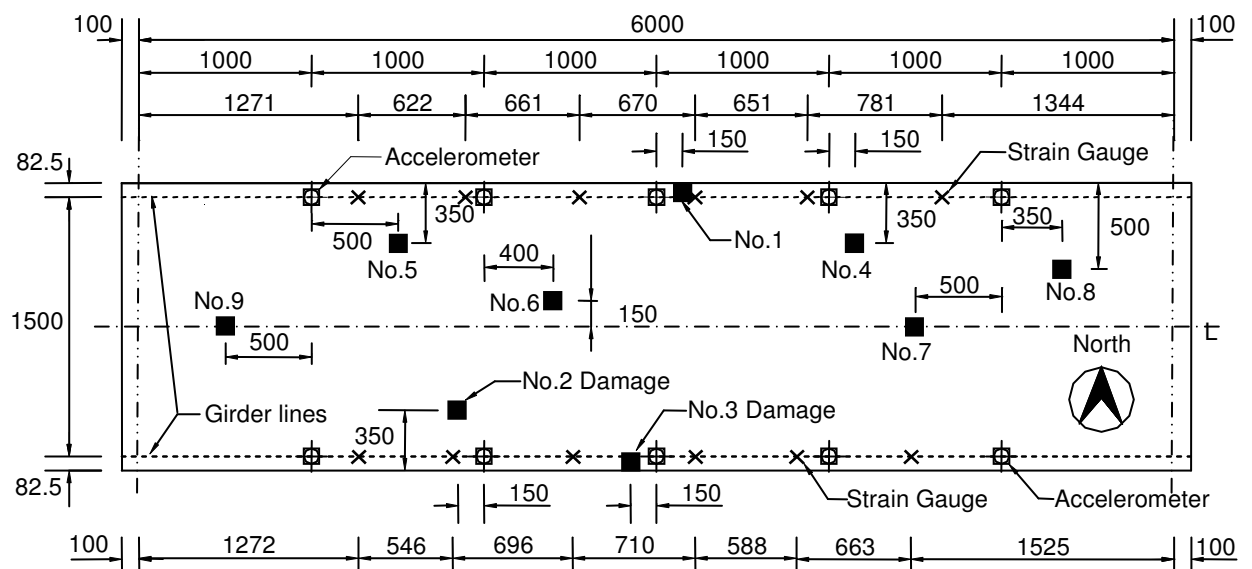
Schematic plan of deck showing locations of induced damage and sensors (dimensions in mm).
